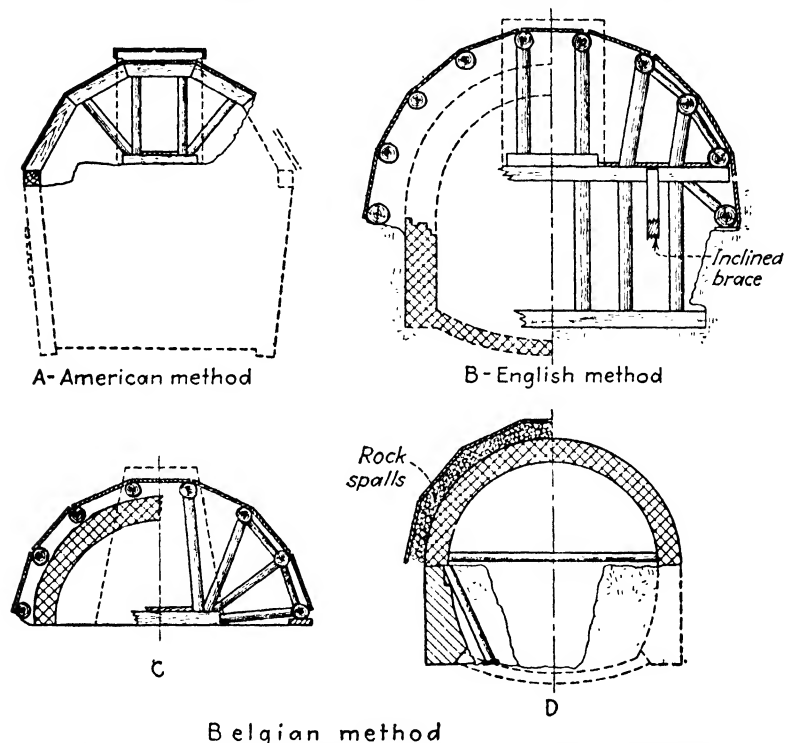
Various typical methods of driving and timbering large soft-ground tunnels.
